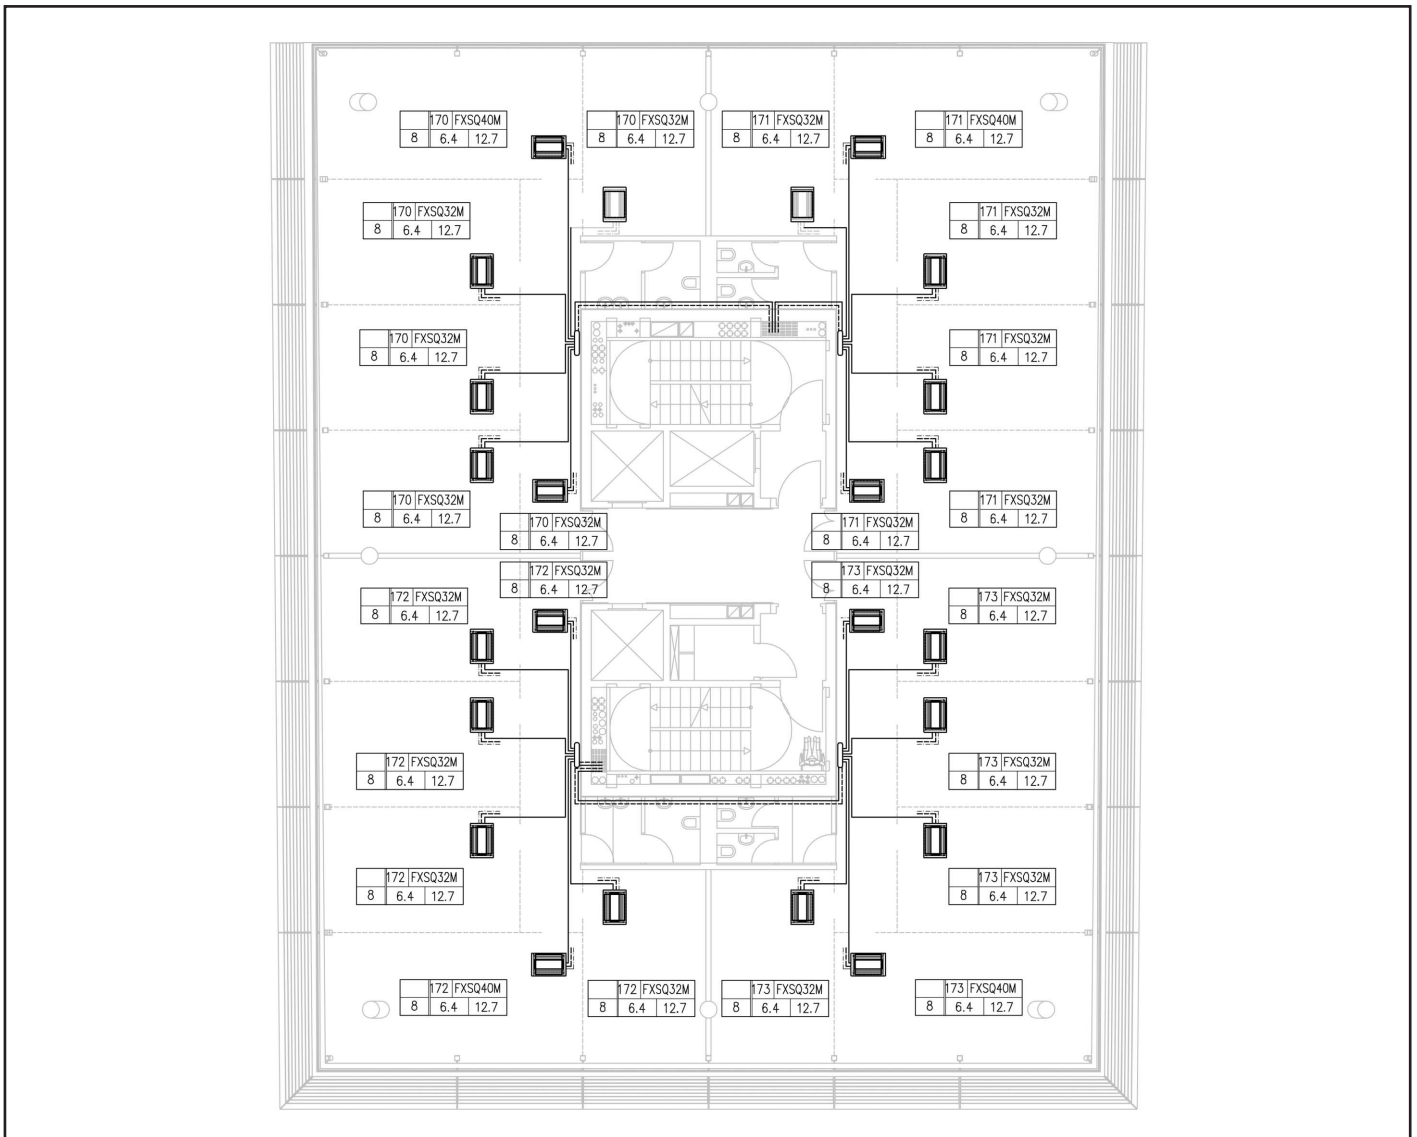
Acciaio Bldg. Office Typical Floor Plan
